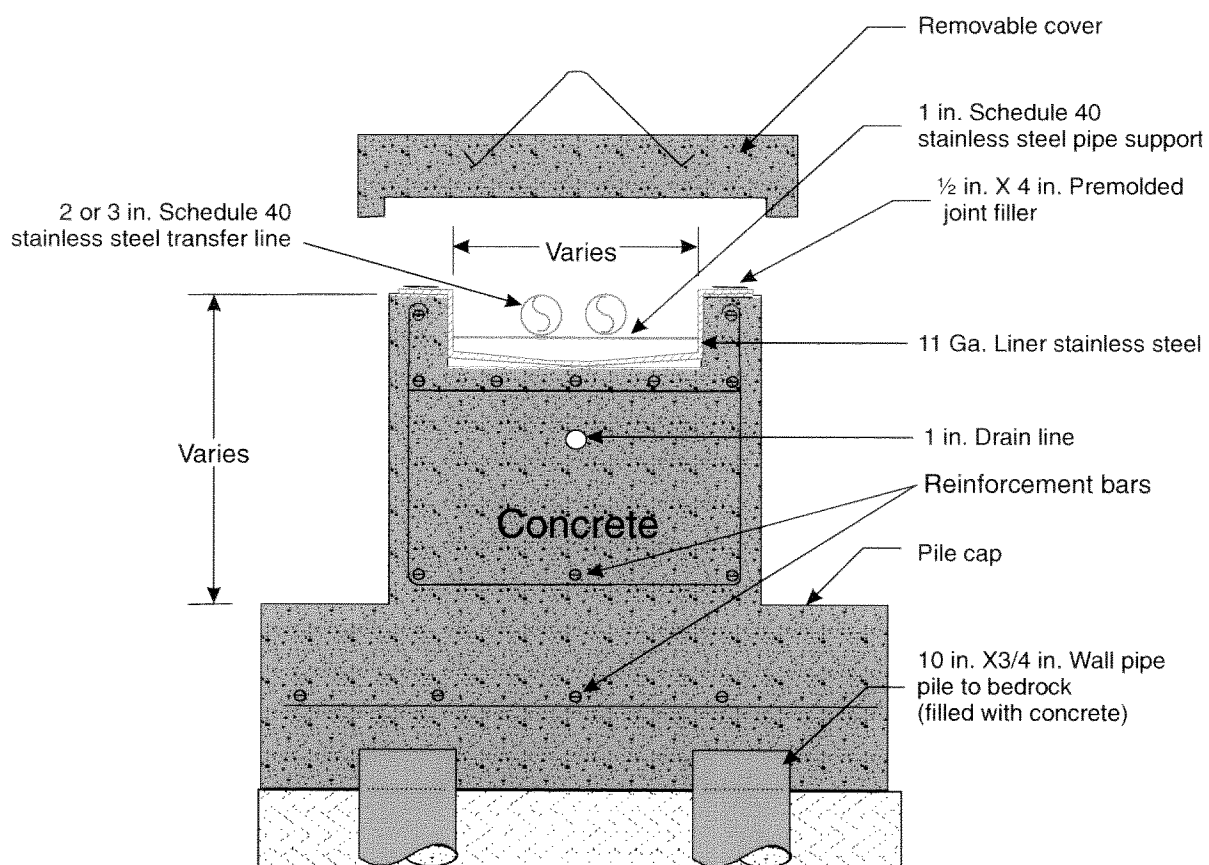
Piling and support cap design for the stainless-steel-lined concrete trough encasement design.
